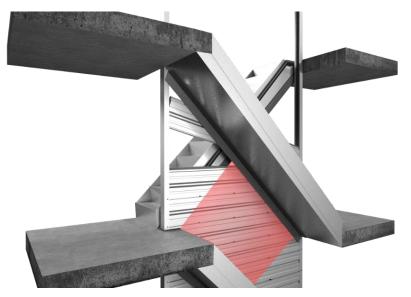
The section of horizontally oriented wall providing fire separation highlighted
